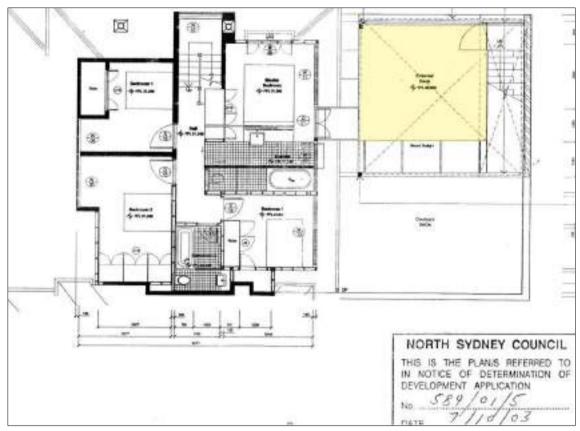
External deck off Master Bedroom at No.17 King George Street highlighted in yellow.
